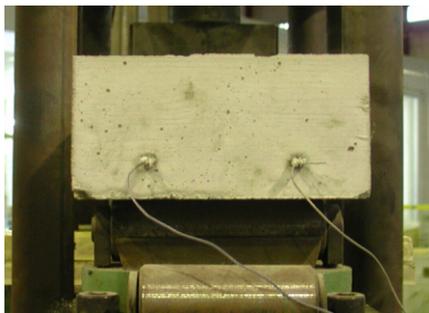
A picture of the section of a self-sensing CF-GFRP rods reinforced beam.
